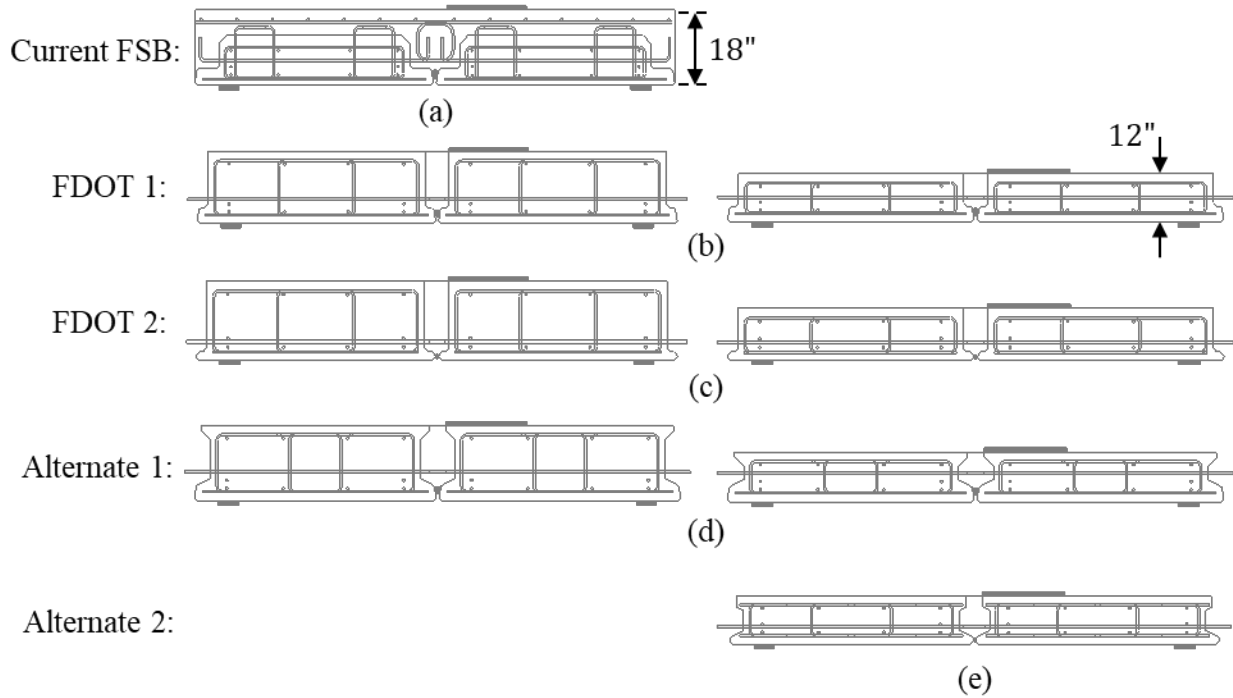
Specimen details: (a) current FSB joint detail, (b) proposed FDOT 1 keyway, (c) proposed FDOT 2 keyway, (d) proposed Alternate 1 keyway, and (e) proposed Alternate 2 keyway
